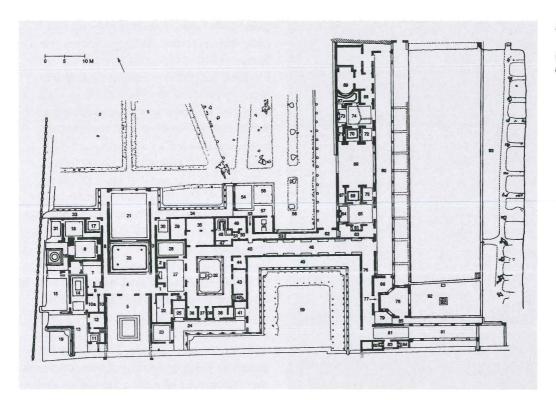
Oplontis. Plan of the Villa with excavated gardens. (After Jashemski 1979, foldout plan).
